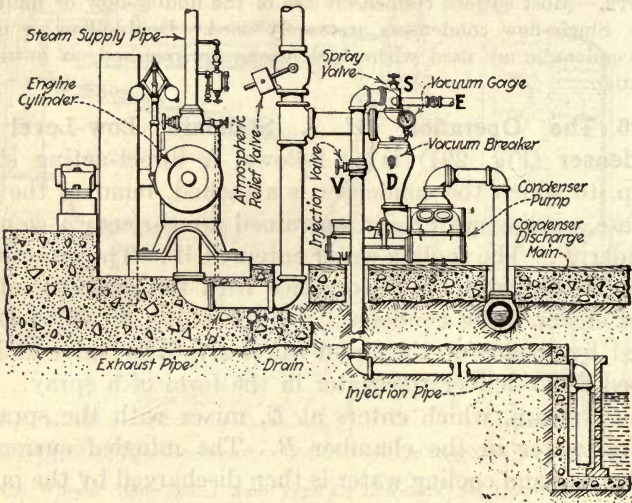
Installation Of Jet Condenser With Reciprocating Engine.
